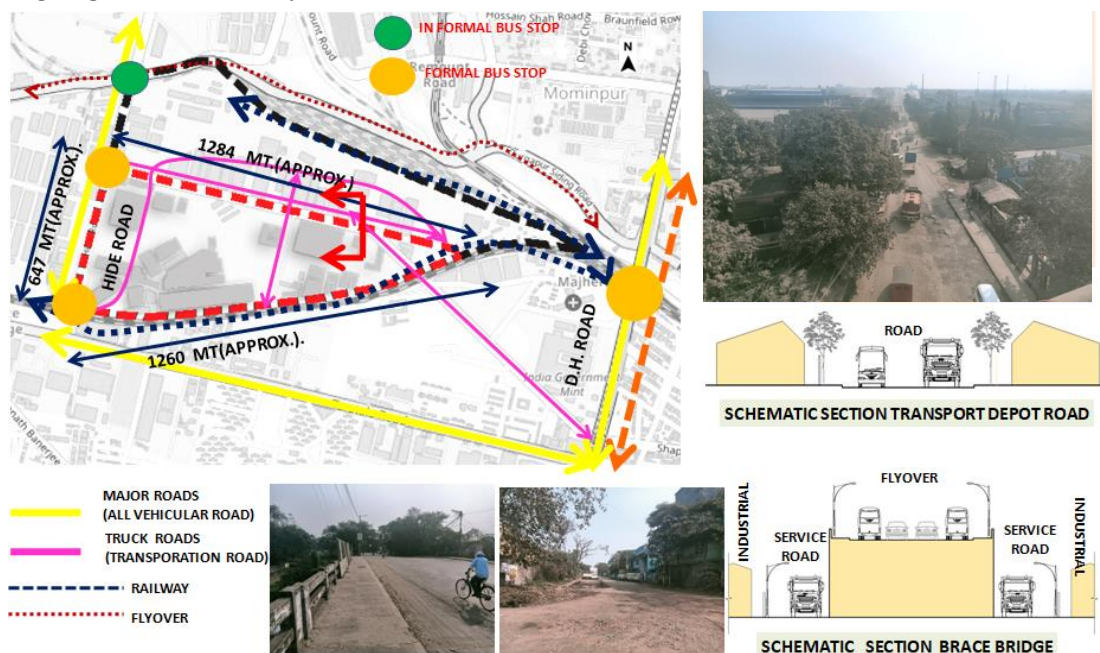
Pathway Plan & Schematic section of Site (Source: Author)
